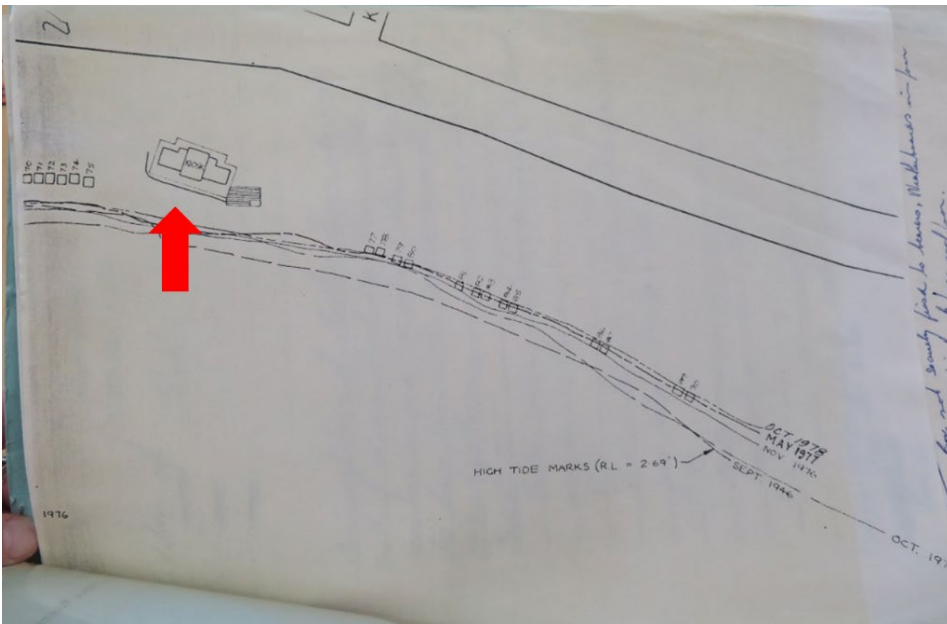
Plan of Dendy Street Beach Bathing Boxes showing the footprint and outline of the kiosk building, Kinane Street is visible at the top of the plan, 1976
